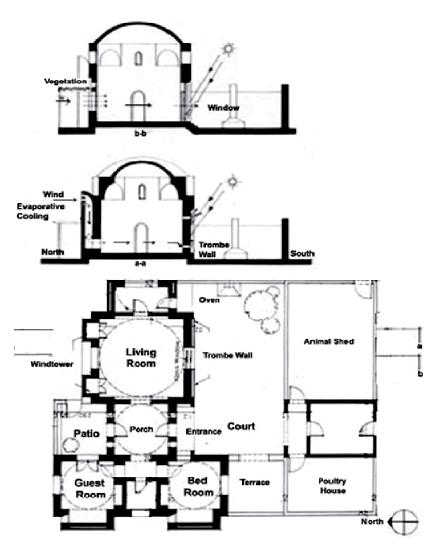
Plan and section of El-Tahrir eco house, South El-Tahrir (DDC, 2006)
